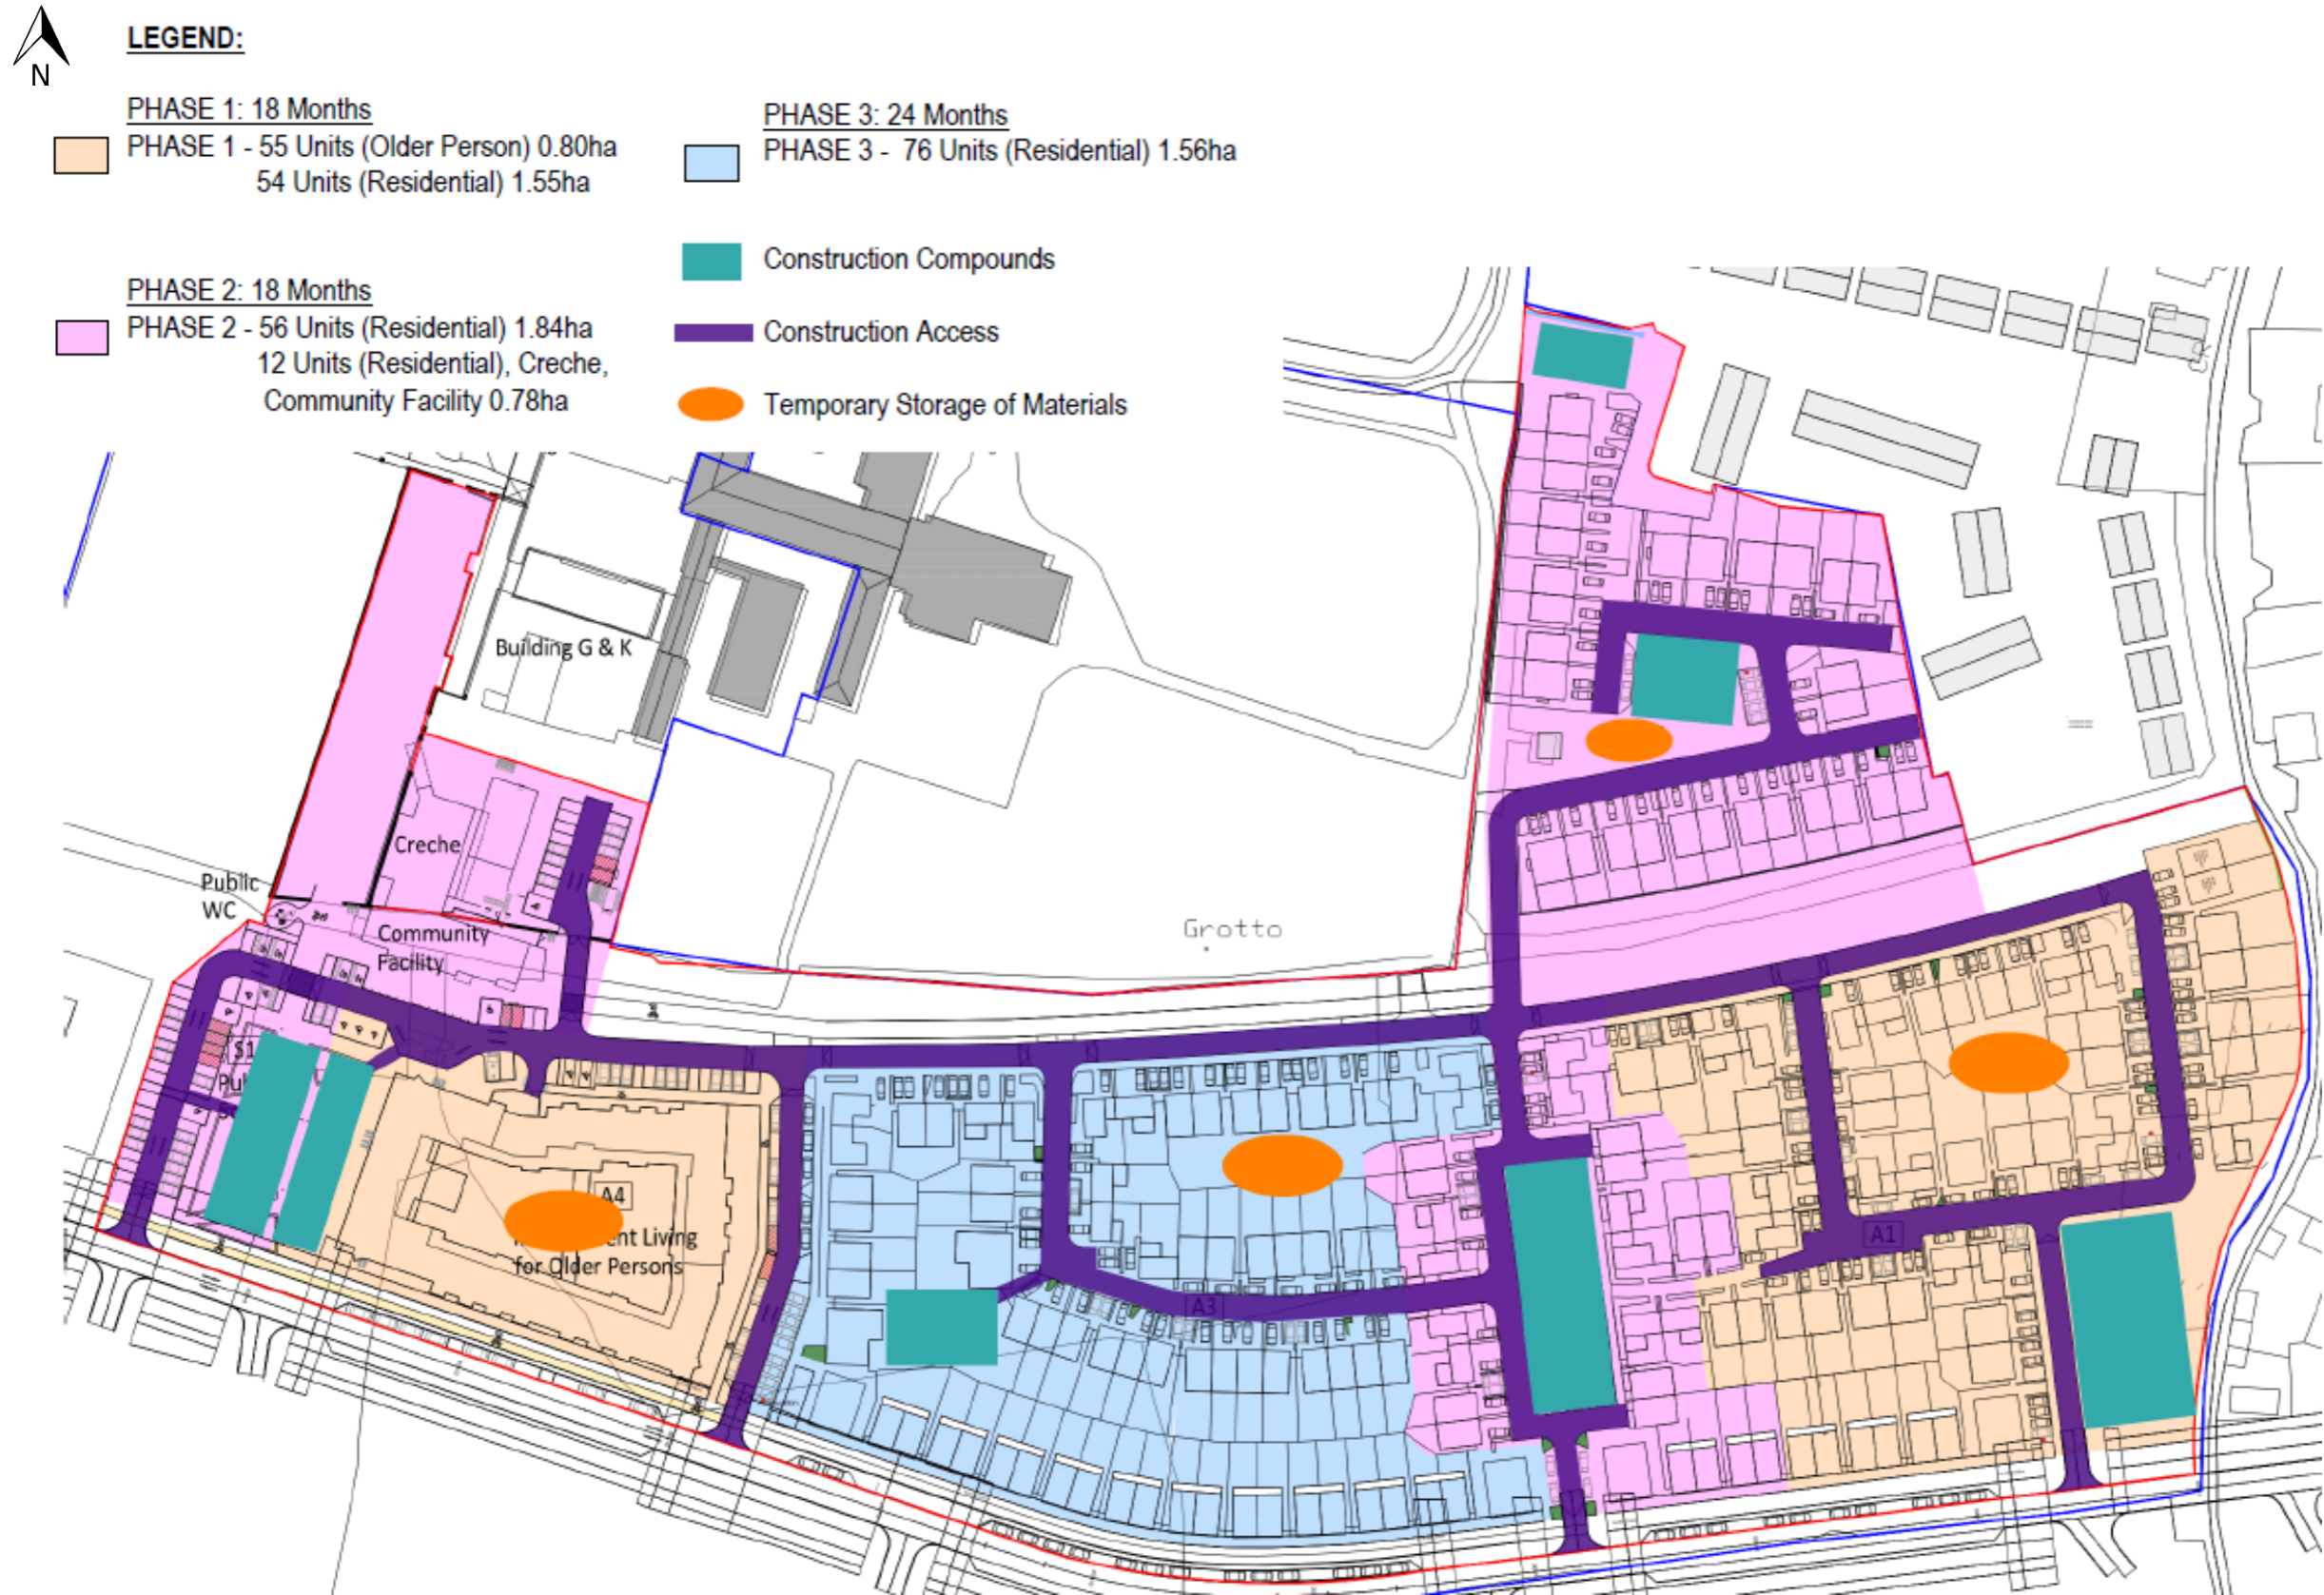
Phasing Plan | Not to scale | Based on information provided by: EML Architects
